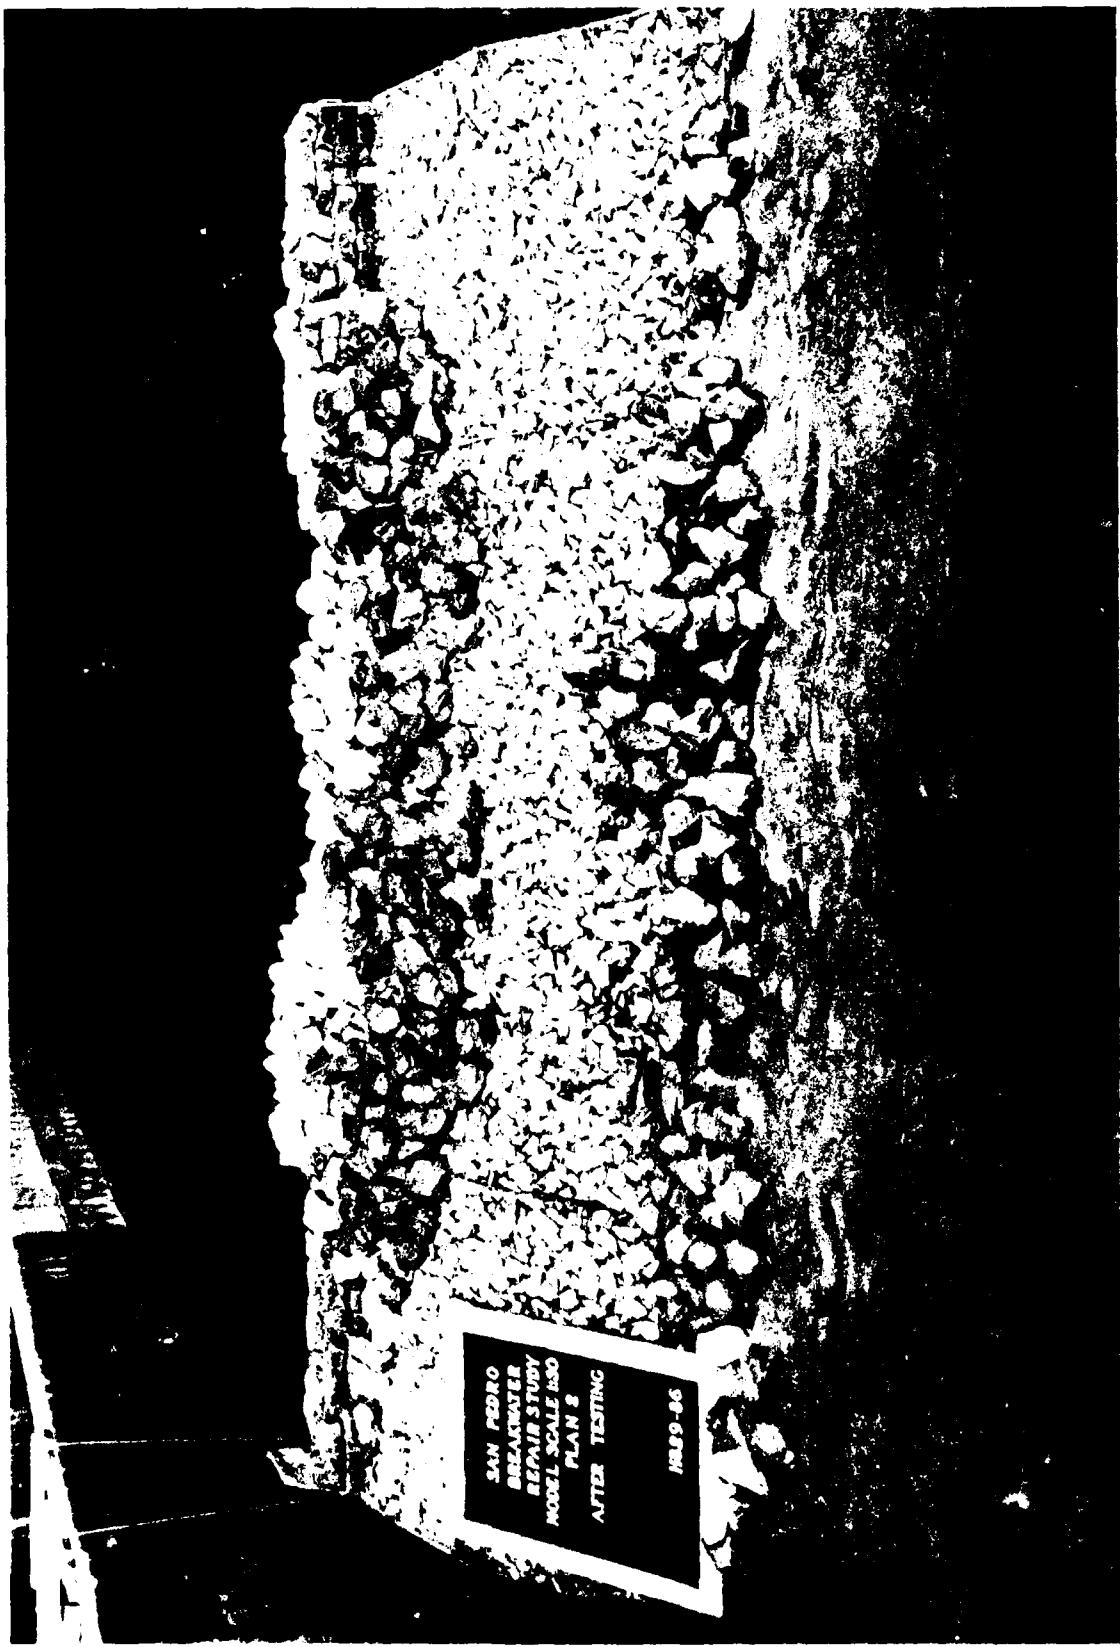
Sea-side view of Plan 2 after subjection to Hydrograph A.
